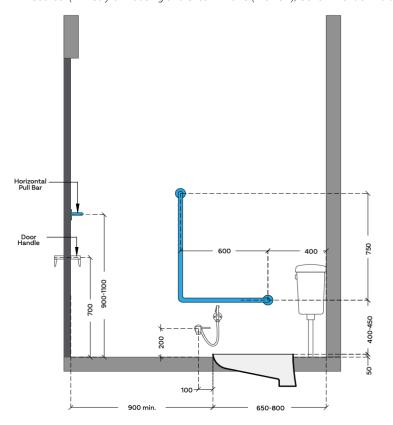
Detail of accessible washroom: Sectional elevation (in mm)
